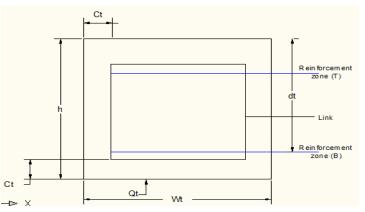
Typical Cross-Section of a Tyre Fibre Concrete Cube with Temperature Load
